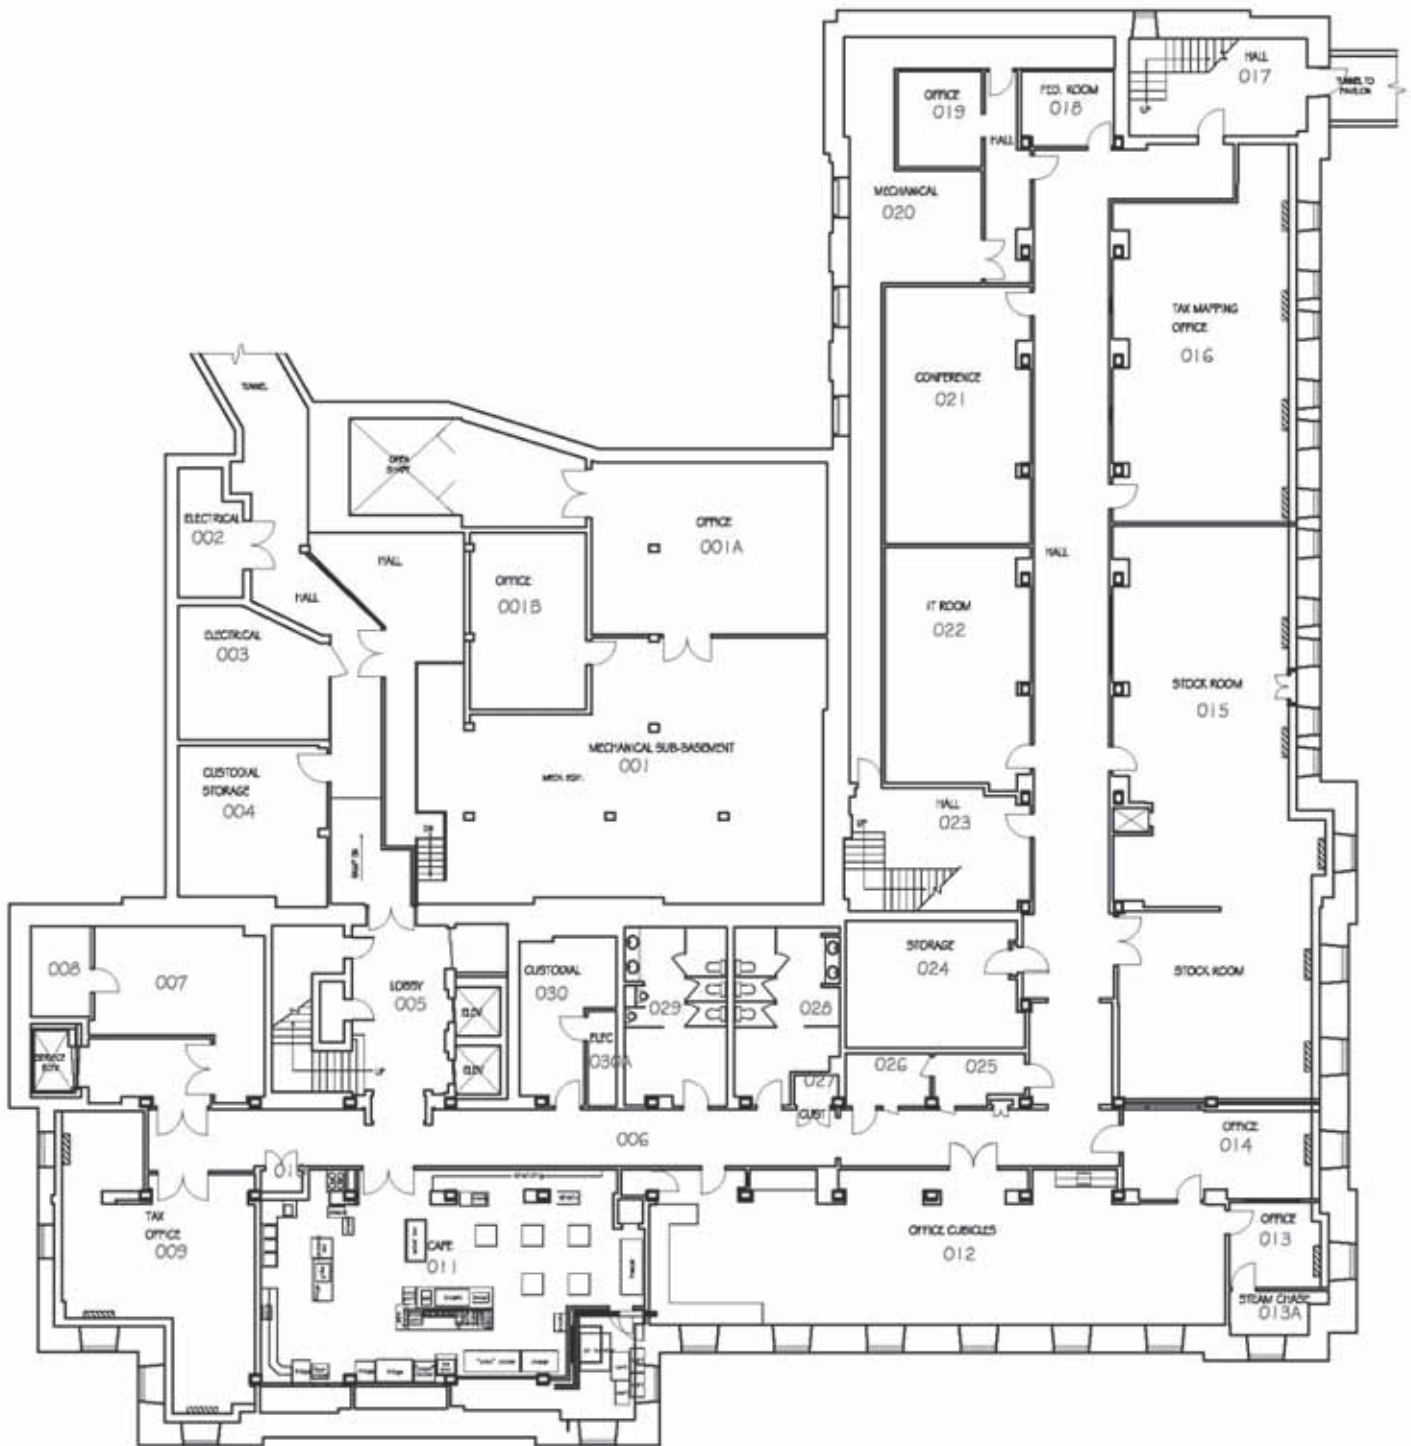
Basement Floor Plan (source: VT Buildings & General Services, N.T.S.)
